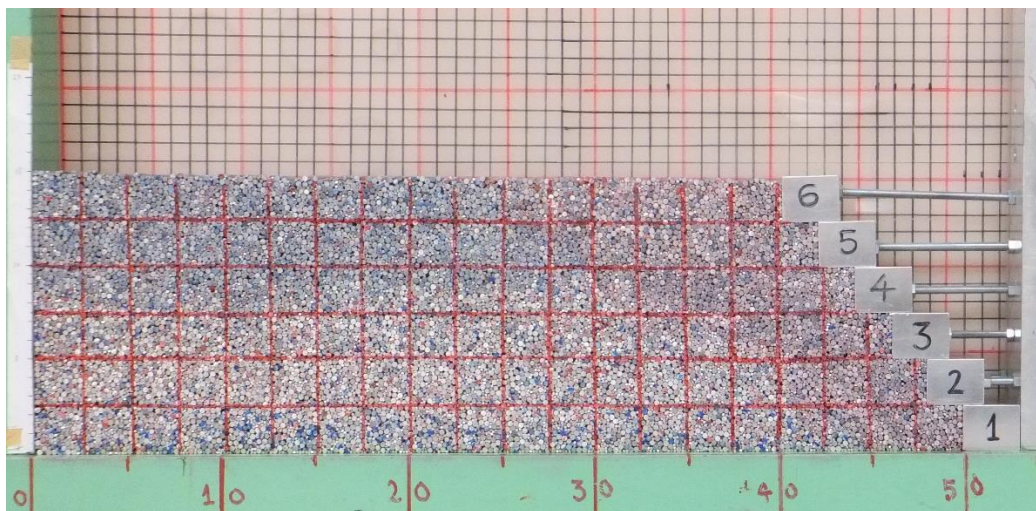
Initial setup of model ground and the retaining wall blocks system
